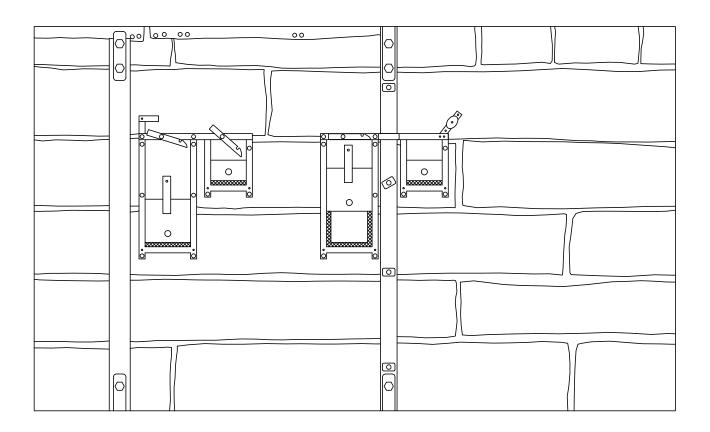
Building A 182 New Cross Road: East Facing Elevation, Projection Room
